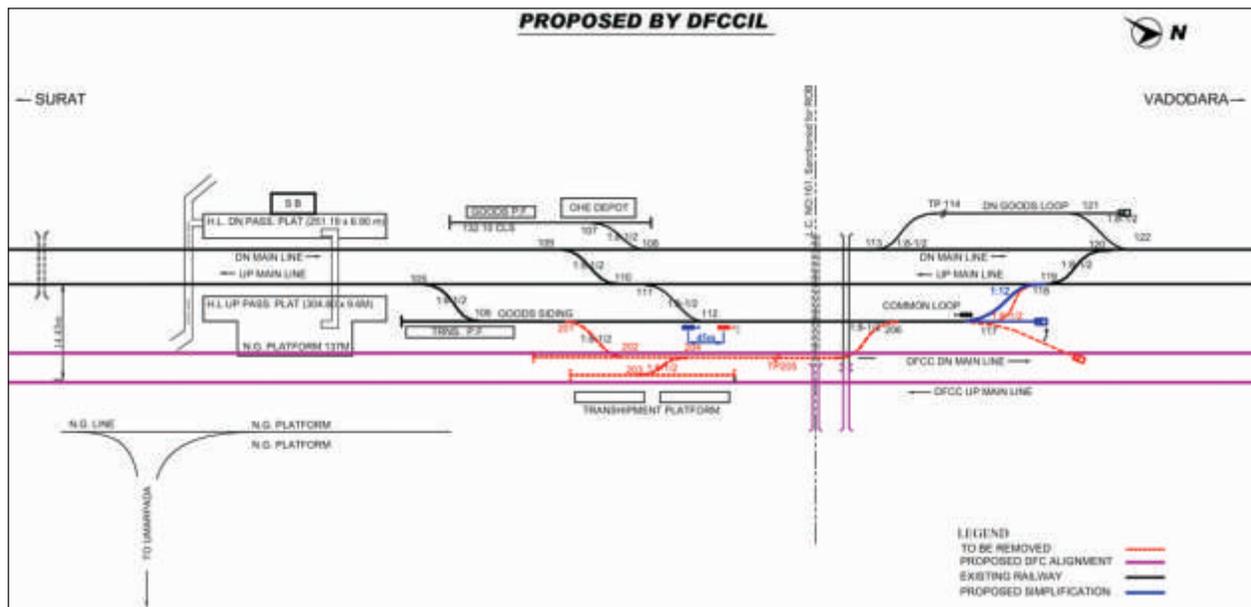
Simplification proposed by DFCCIL for Kosamba Yard in order to retain original layout to avoid any change in Interlocking arrangement.
